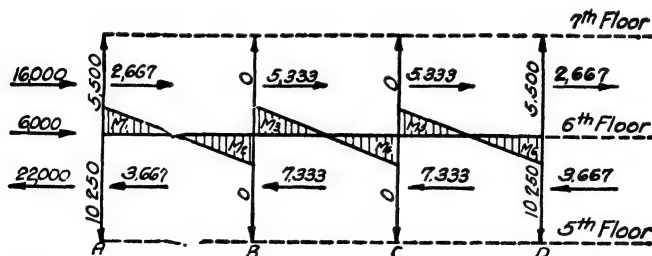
Column shears and girder moments at sixth floor, calculated by Method II-A.
